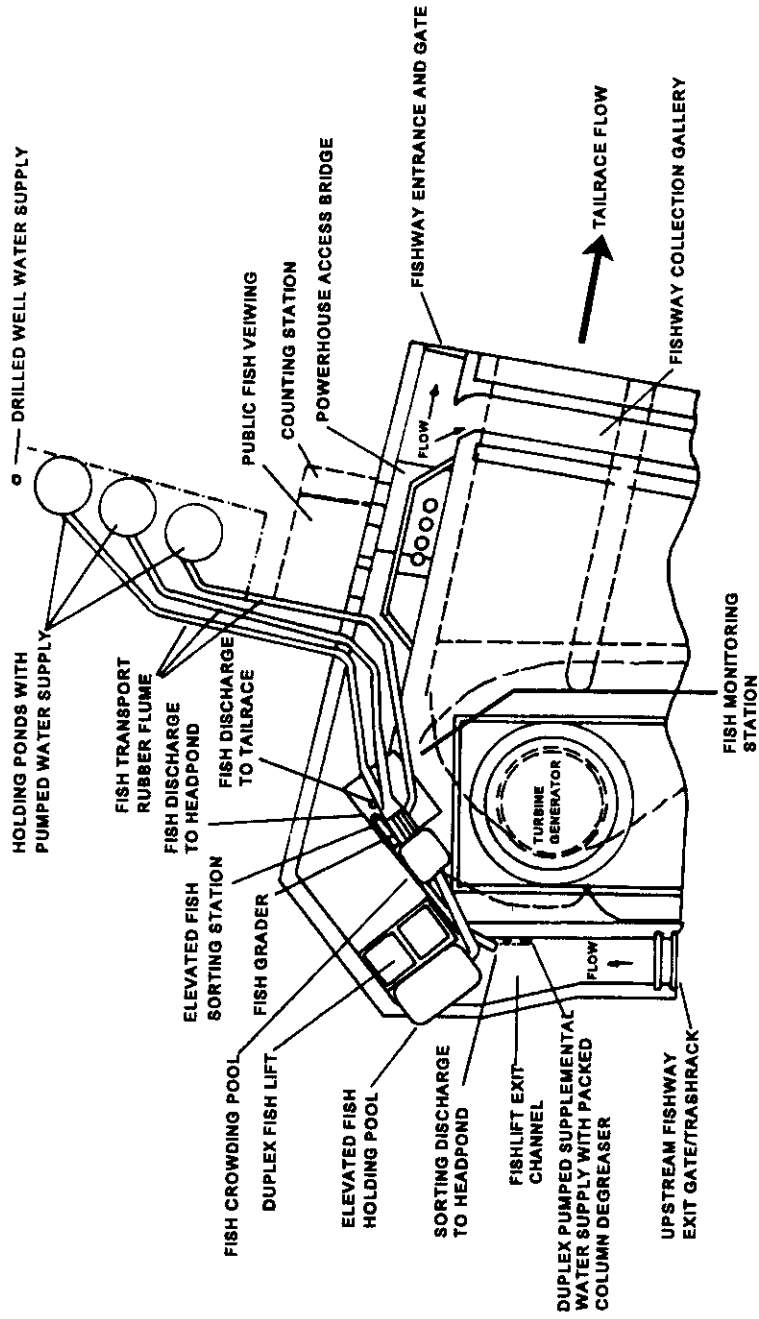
Plan view of fish passage facilities at Veazie Plant C (Source: BHE 1990h).
